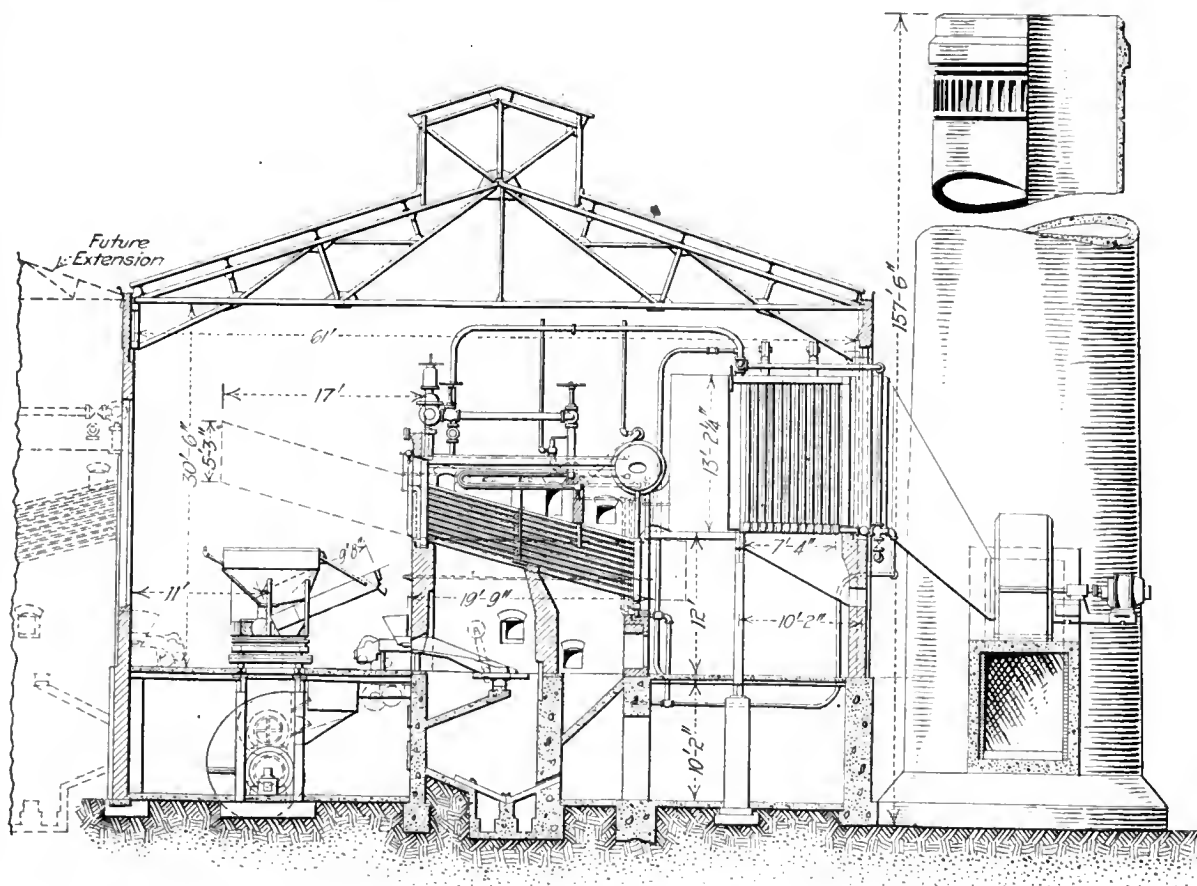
CROSS-SECTION OF BOILER ROOM SHOWING ARRANGEMENT OF EQUIPMENT AND SCHEME FOR EXTENSION
